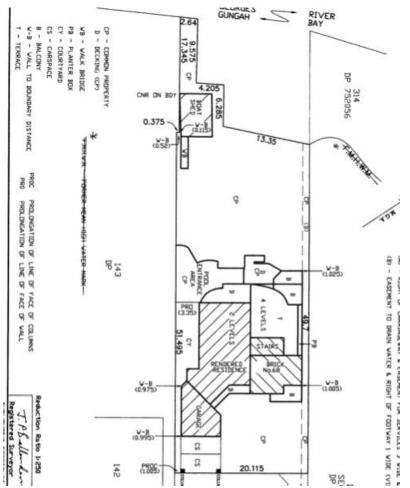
Extract of Strata Plan – SP 79841 showing configuration of the site
